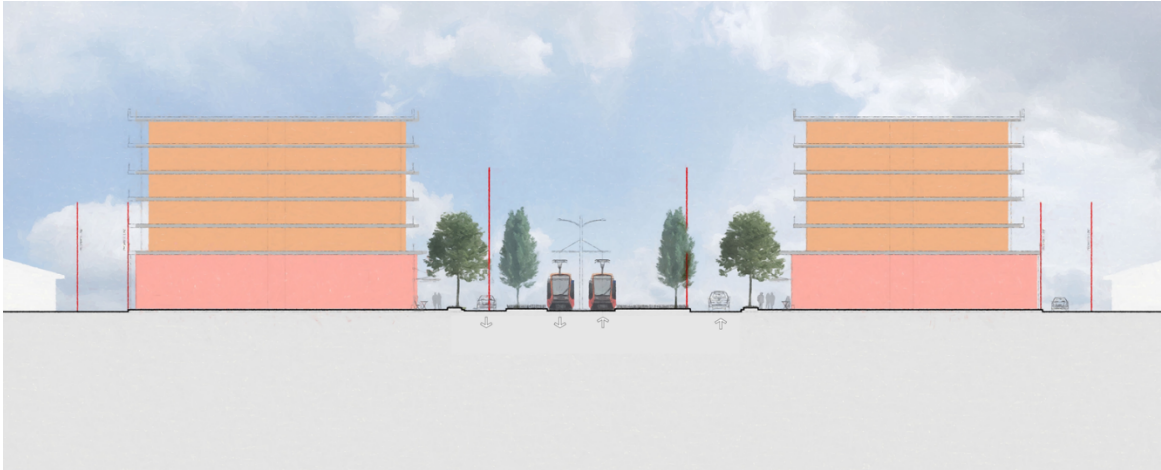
SECTION – TYPICAL VIEW LOOKING NORTH (E.G. FROM 34 AVE)
